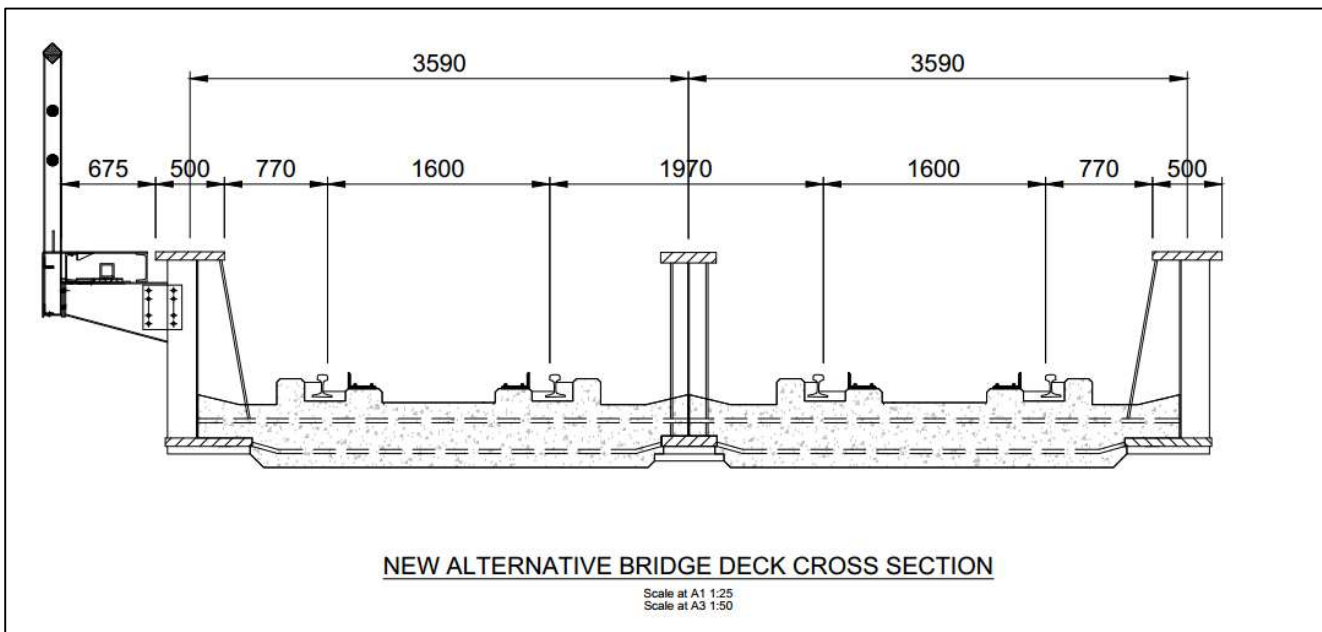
Typical cross-section of a slab track deck for one of two bridges.
